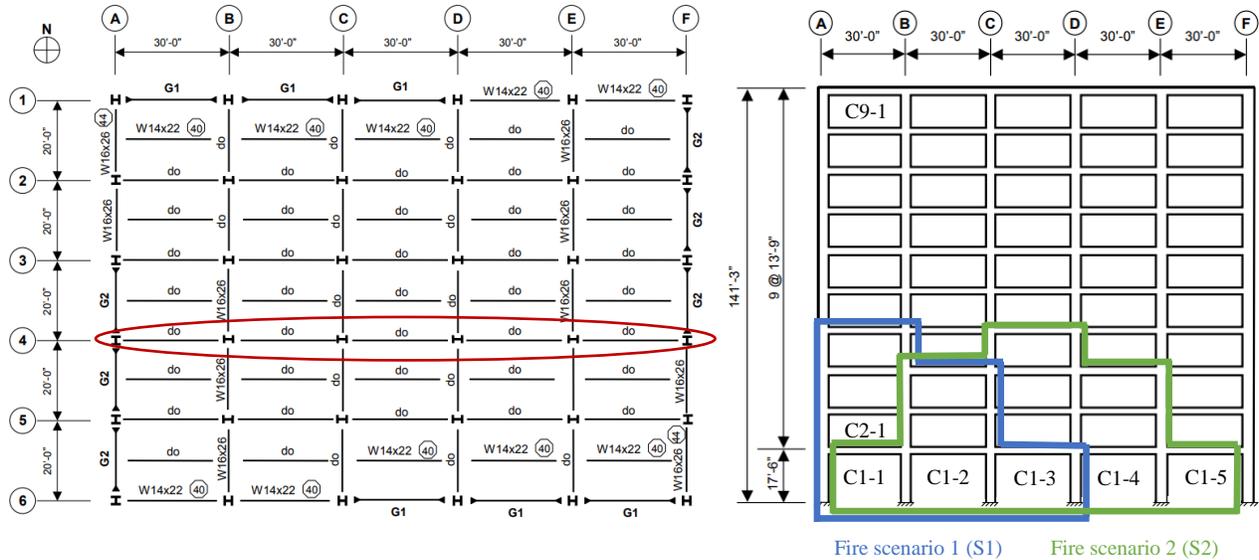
Plan layout and elevation of the steel frame building (Sadek et al., 2010)
